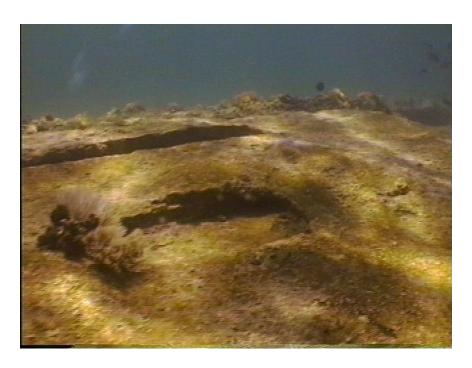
Concrete pour for top of wharf now lying on the bottom
